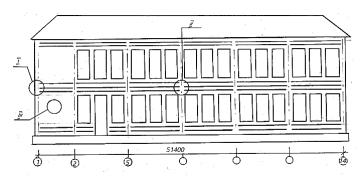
Scheme of strengthening the external brick walls of the building by placing pre-strengthened reinforcements (main facade)
